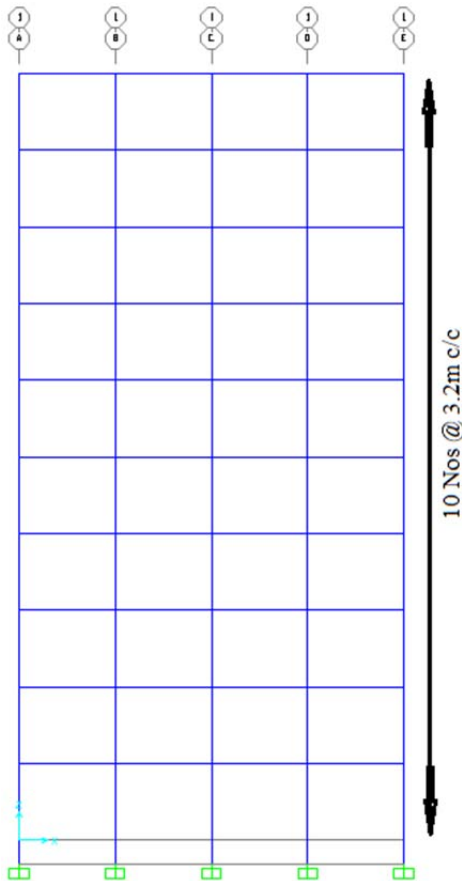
Elevation of Frame in Z direction(vertical) for steel frame without steel bracing
